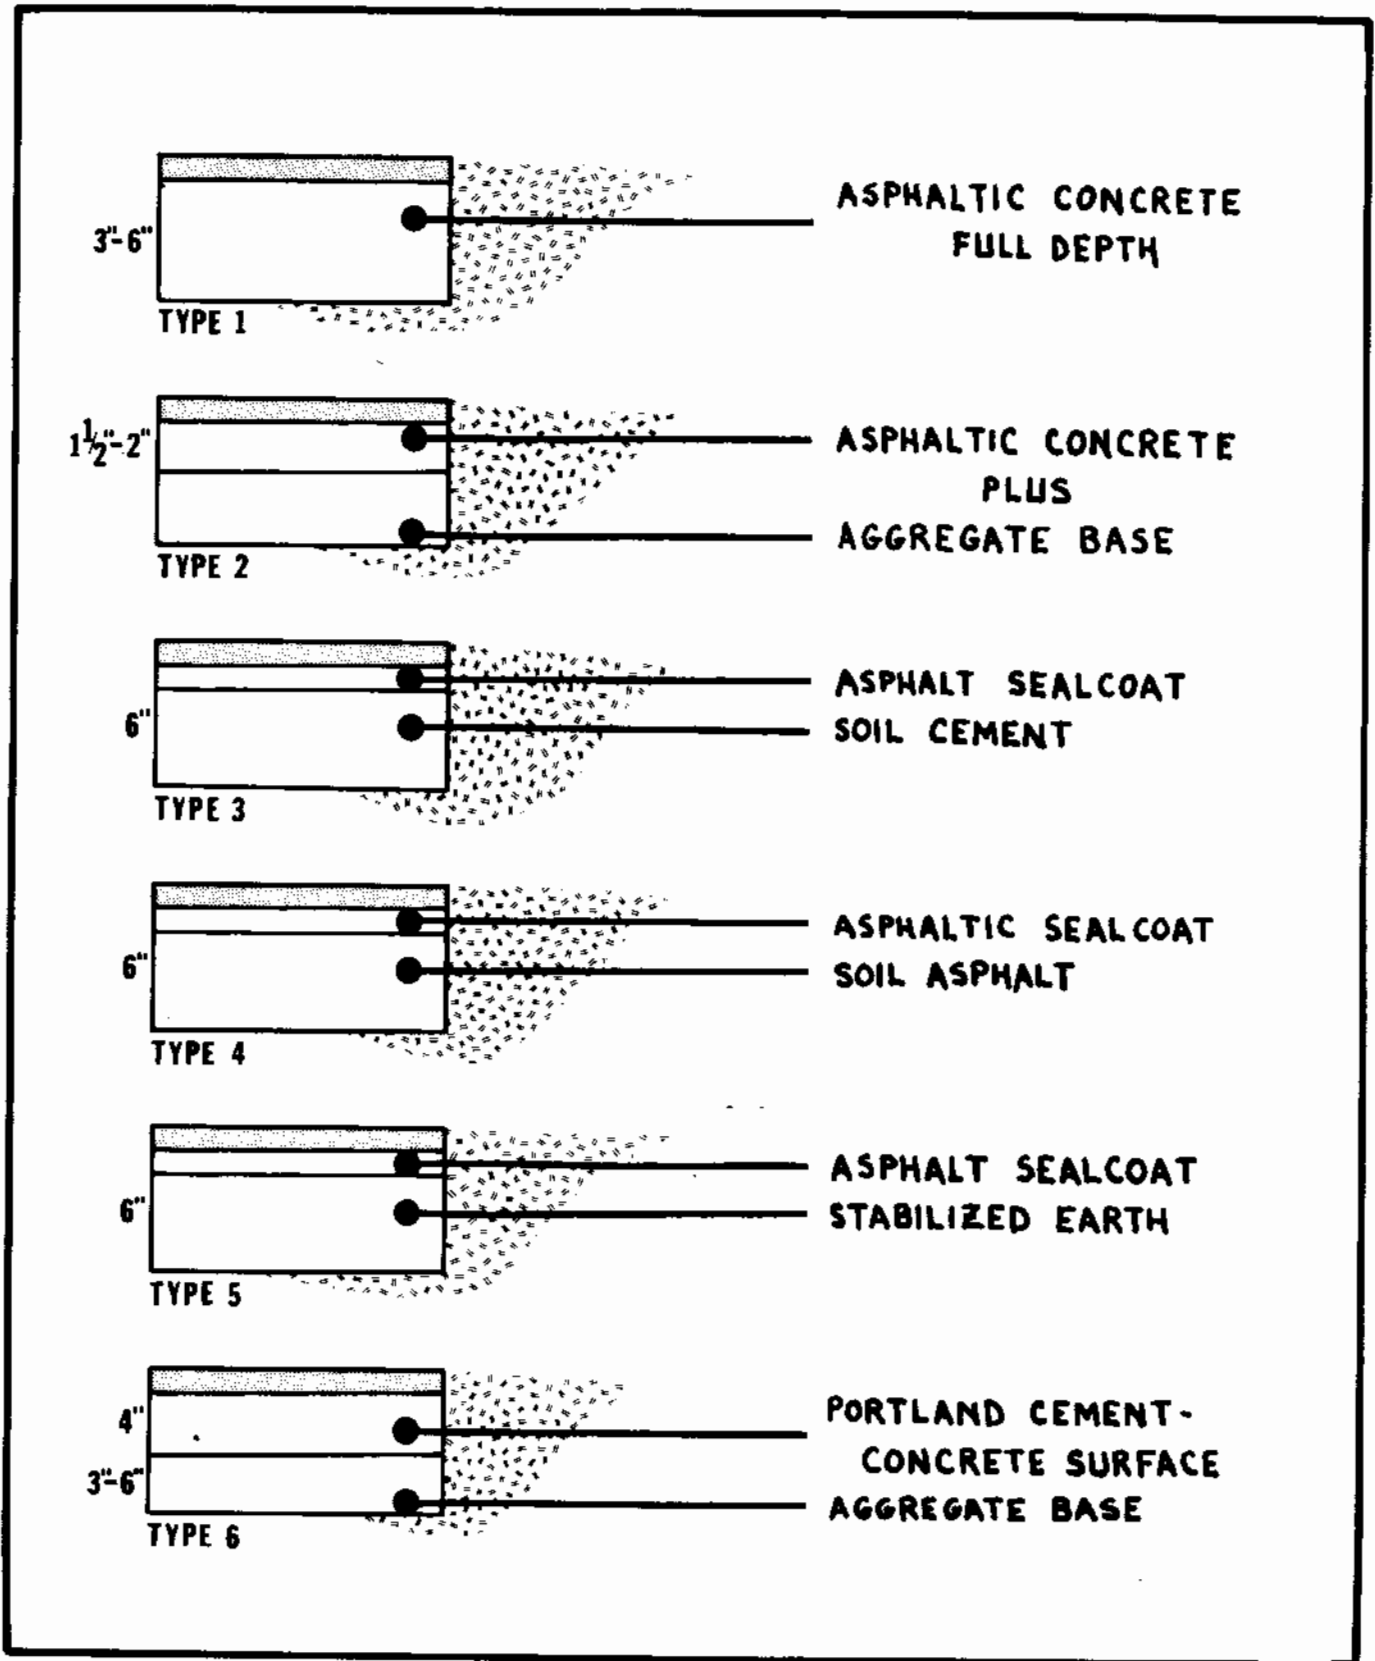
TYPICAL BIKEWAY STRUCTURAL SECTIONS
